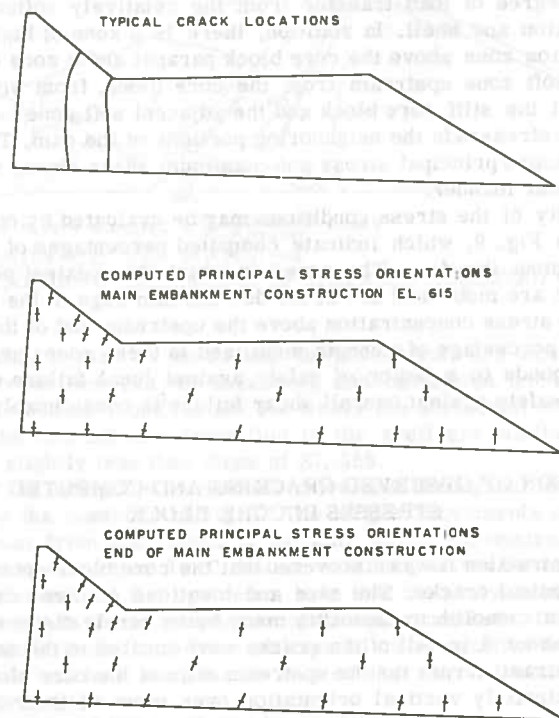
TYPICAL CRACK LOCATIONS AND COMPUTED PRINCIPAL STRESS ORIENTATIONS IN CORE BLOCK OF OROVILLE DAM
